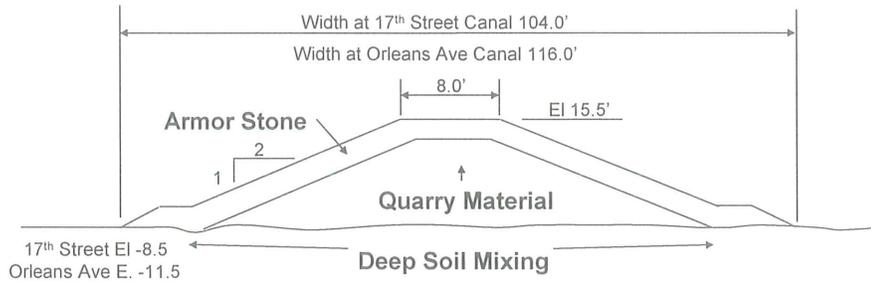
Typical cross section of the 17th Street and Orleans Avenue Canal breakwaters.
